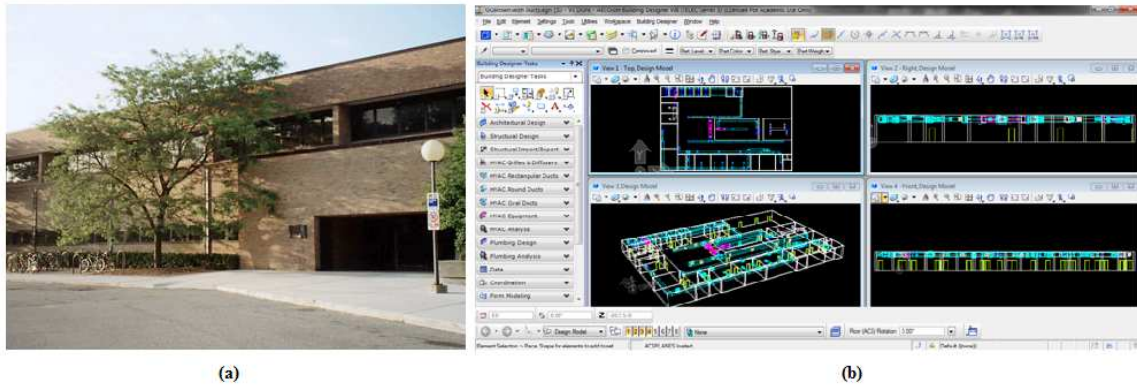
(a) The G.G. Brown Building and (b) HVAC BIM of a section of the building
